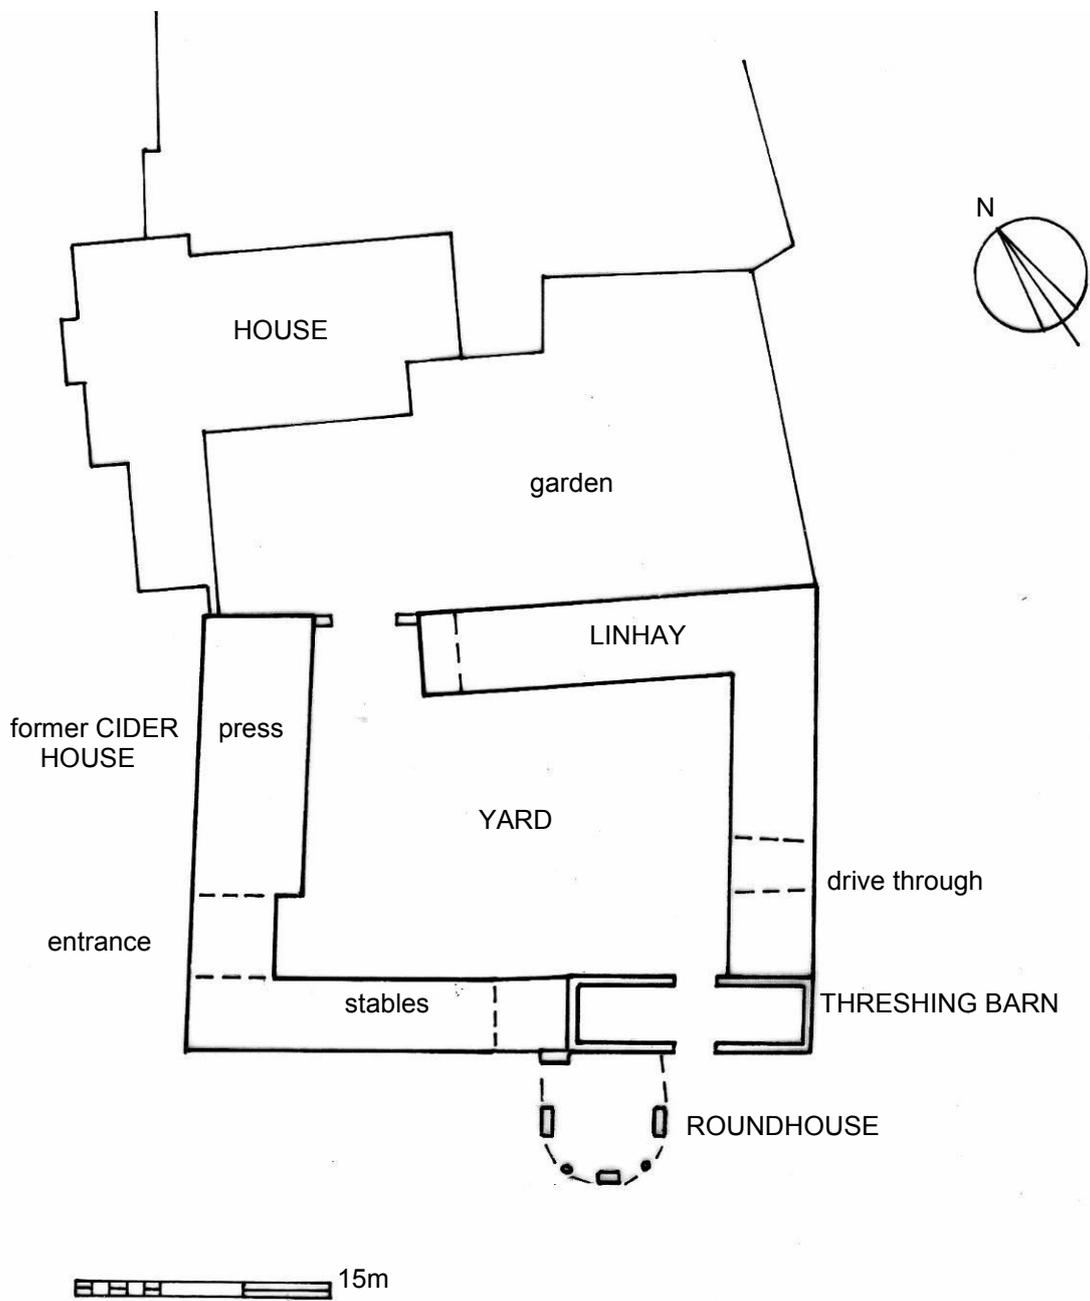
Muddifords Court, Halberton. Site plan, showing principal buildings
